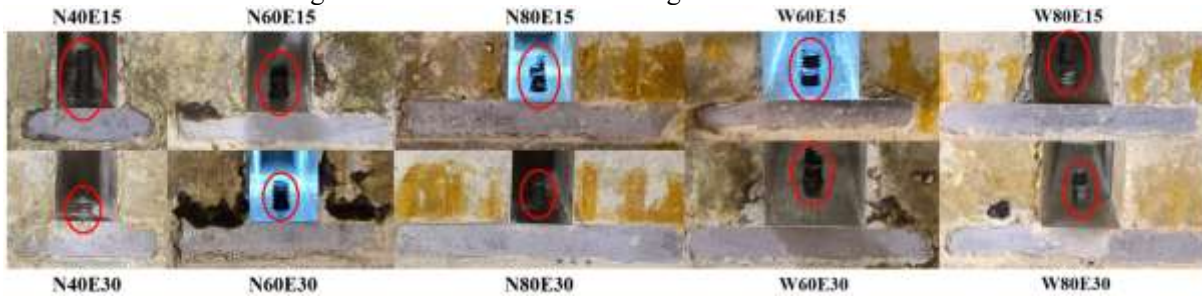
Bolt fractures in the loaded concrete block.
